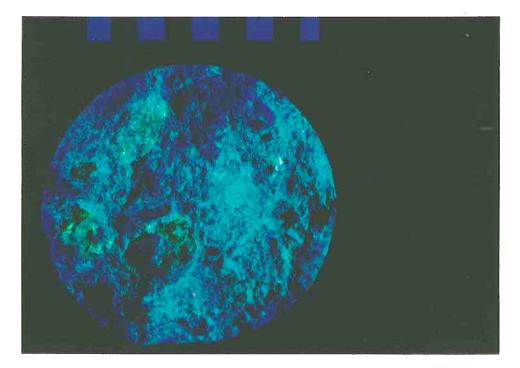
End of core from retaining wall at Shelburne Building treated with uranyl acetate and illuminated with shortwave ultraviolet light. Note greenish fluorescence of fractured surfaces of granite gneiss particles.
